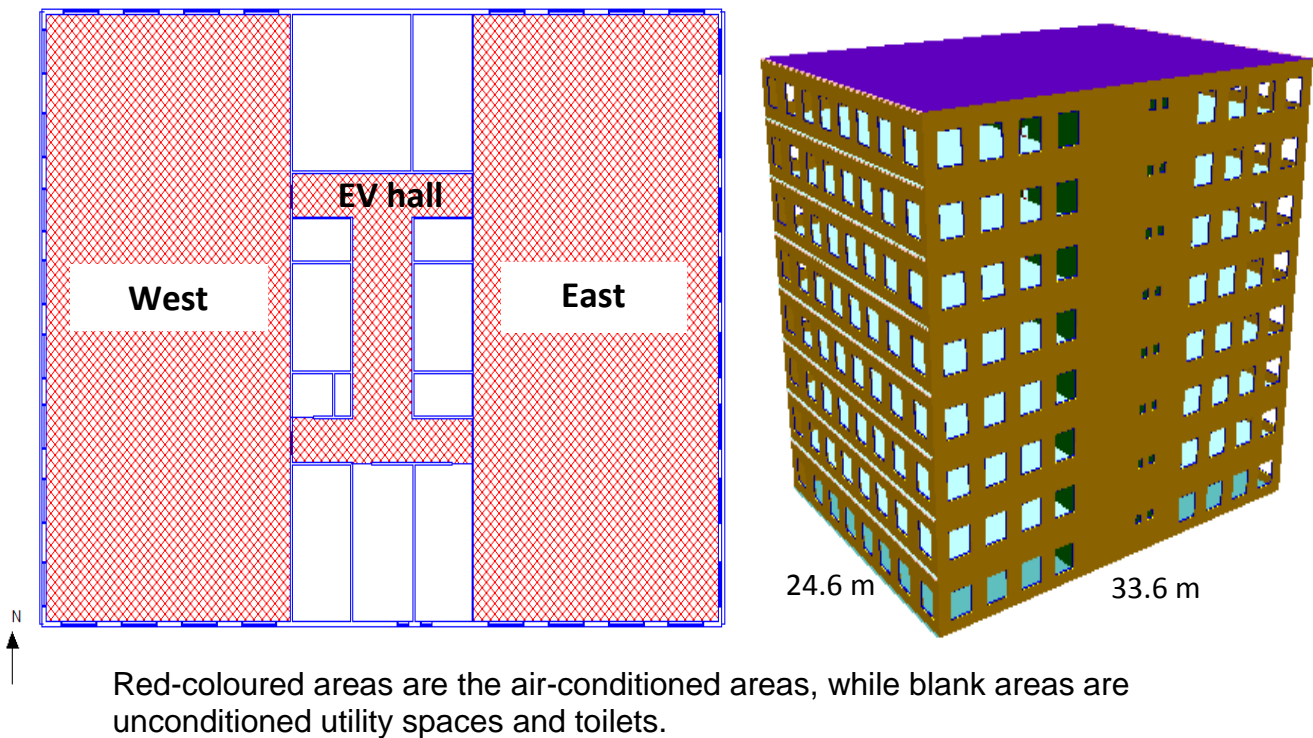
Office building model and zoning for typical 1990s type buildings (a representative floor plan and outward)
